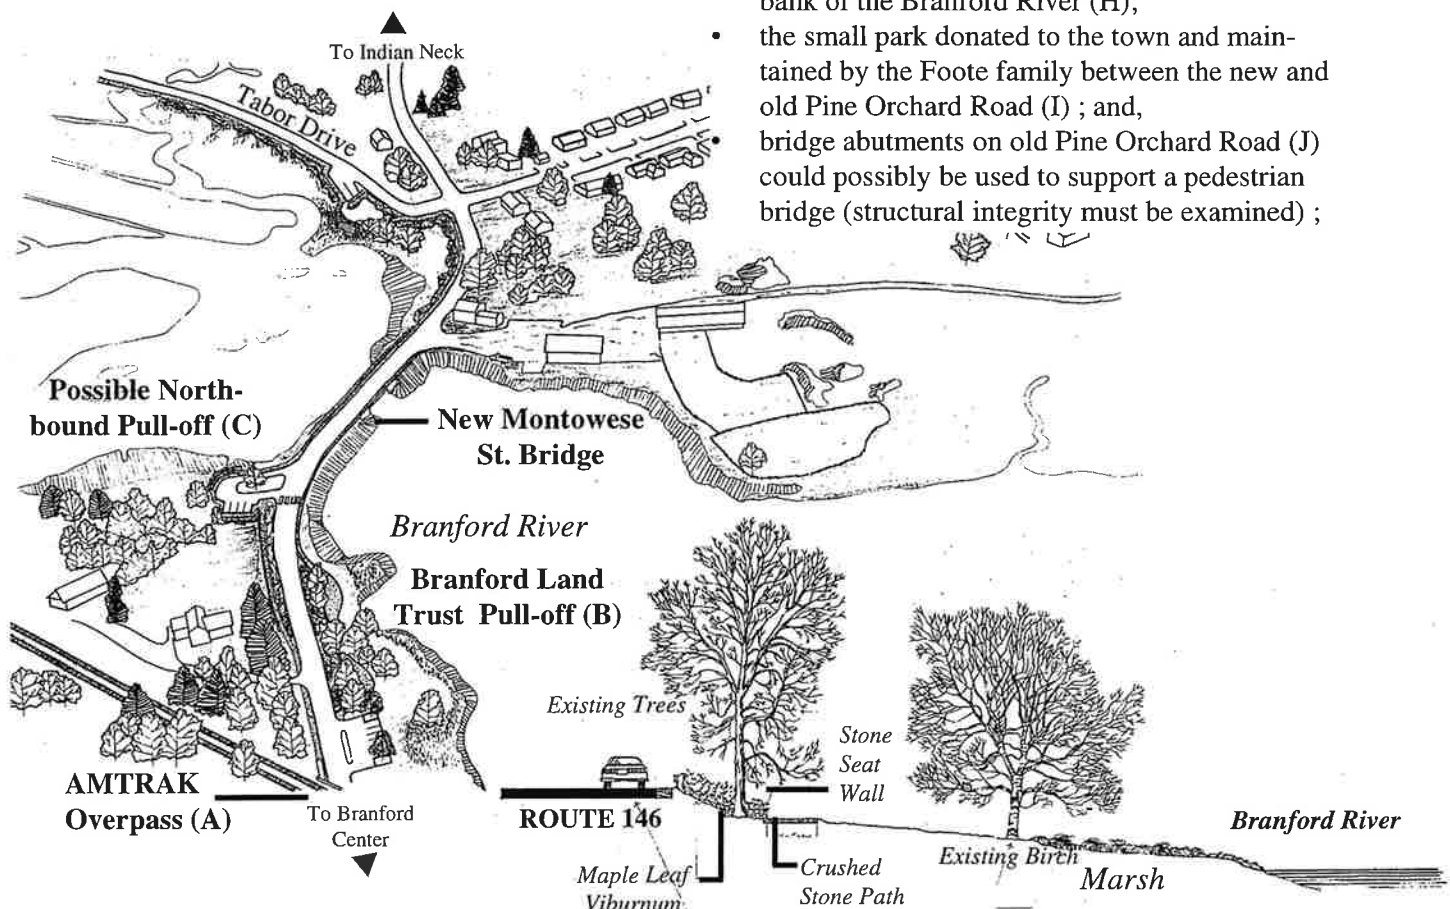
Linking together a series of open spaces along Montowese Street at the Branford River.
